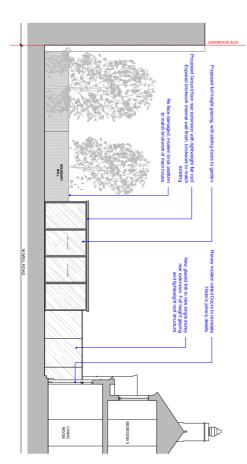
SOUTH ELEVATION AMENDED PROPOSED EXTENSION AND LINK
